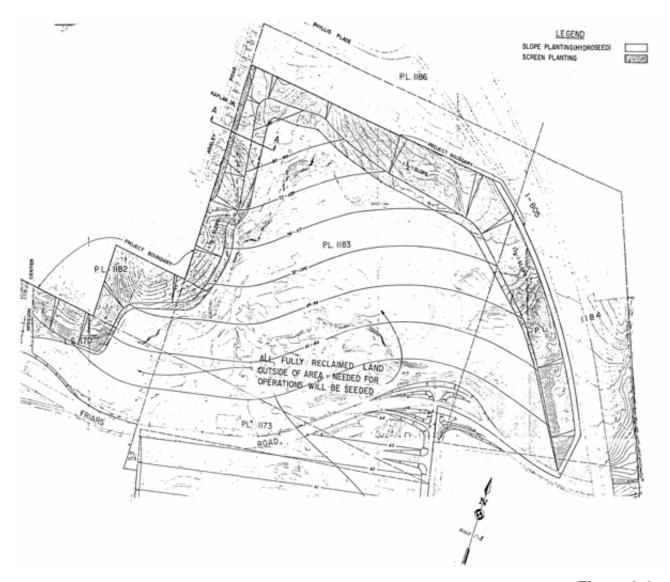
Existing Approved Reclamation Plan Revegetation Plan
